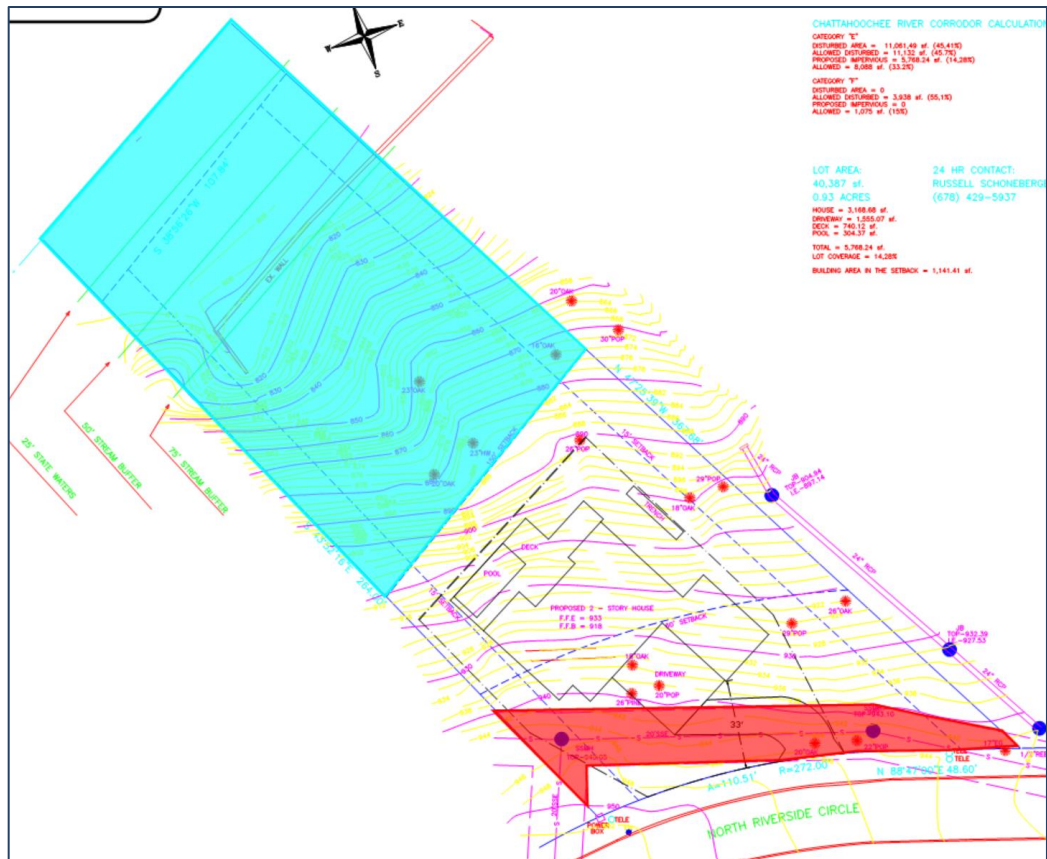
Site plan with the river setback shown in blue and the sewer easement shown in red
